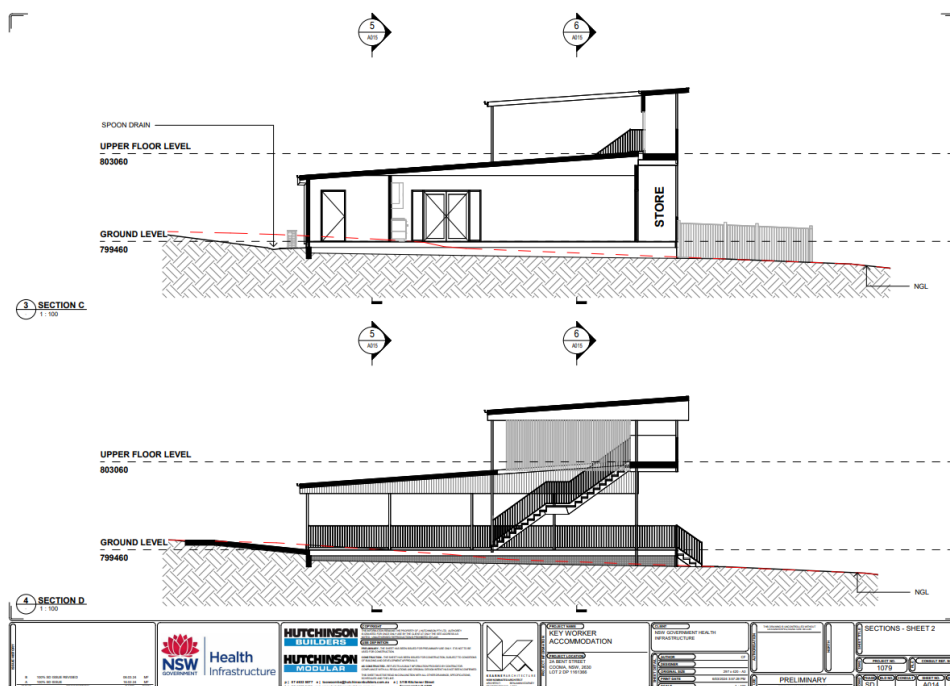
Sections – Sheet 2 (Source: Kearney Architecture)
